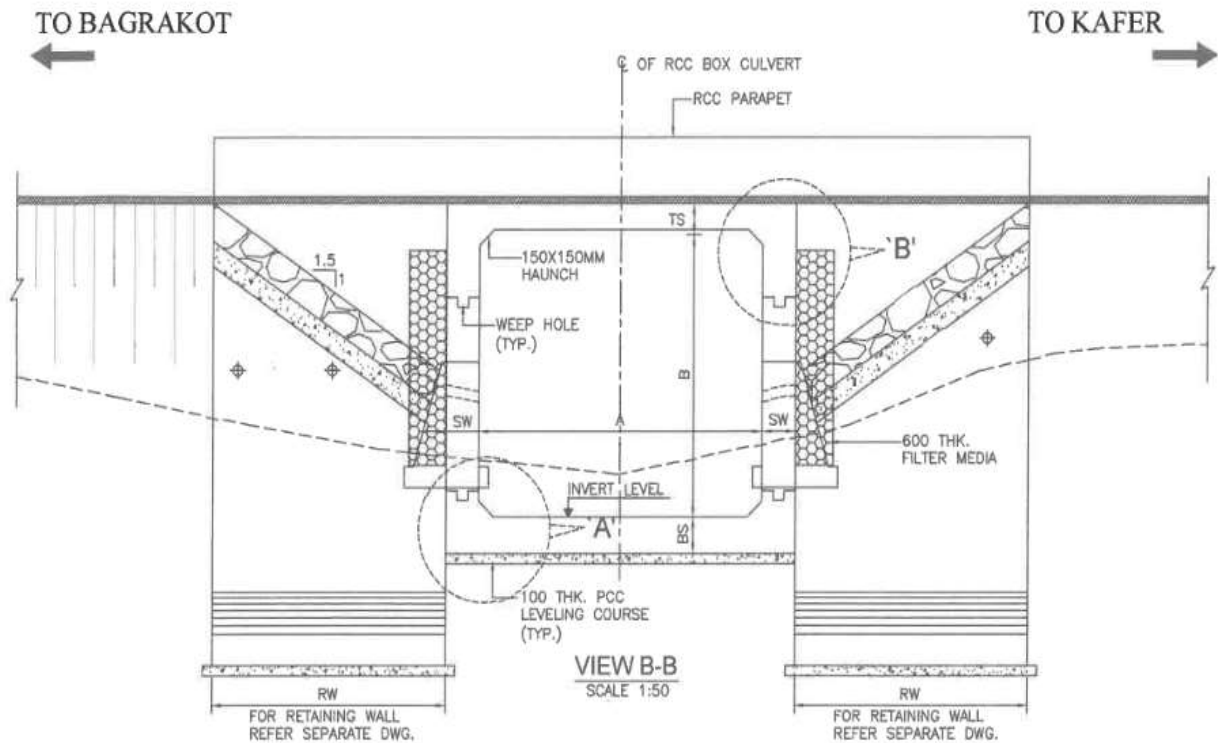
Cross section of 1 box culvert along road. (Source: NHIDCL, PMU-Kalimpong)
